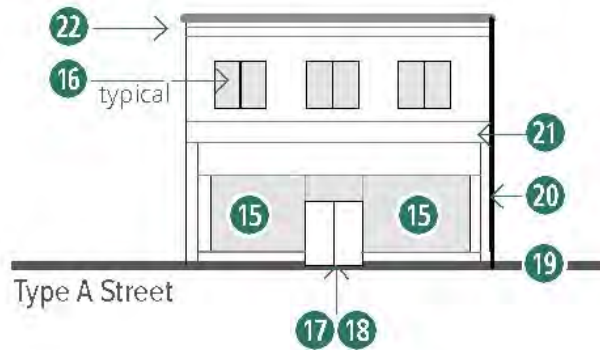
Commercial Storefront Building Elevation: Facade Design Requirements
